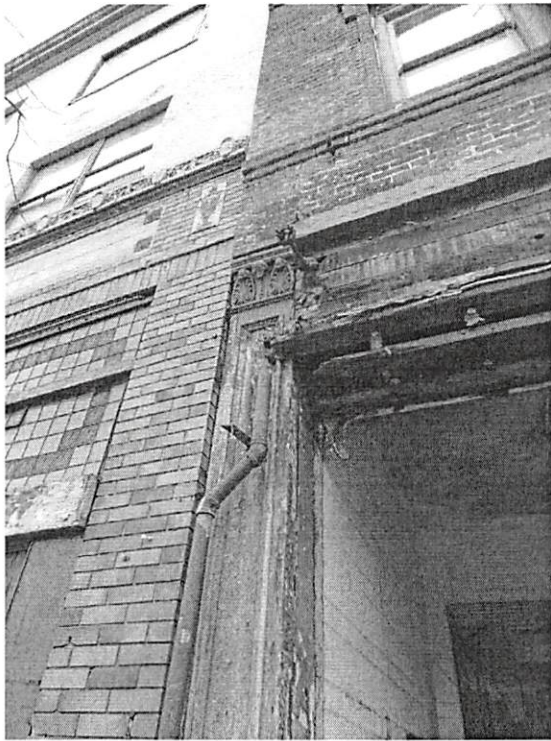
Detail view of engaged column capital ornament at the exterior of the Palace Hotel
